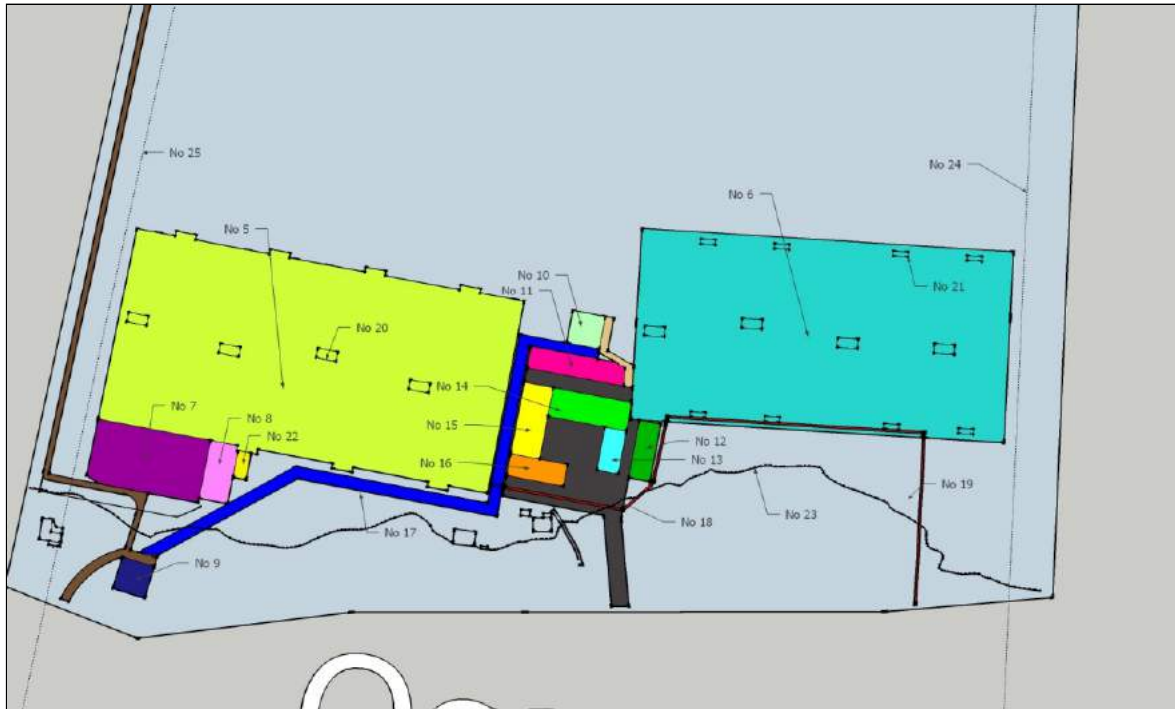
Revised Site Layout Plan indicating the infrastructure layout of proposed Alternative 2 (preferred).
